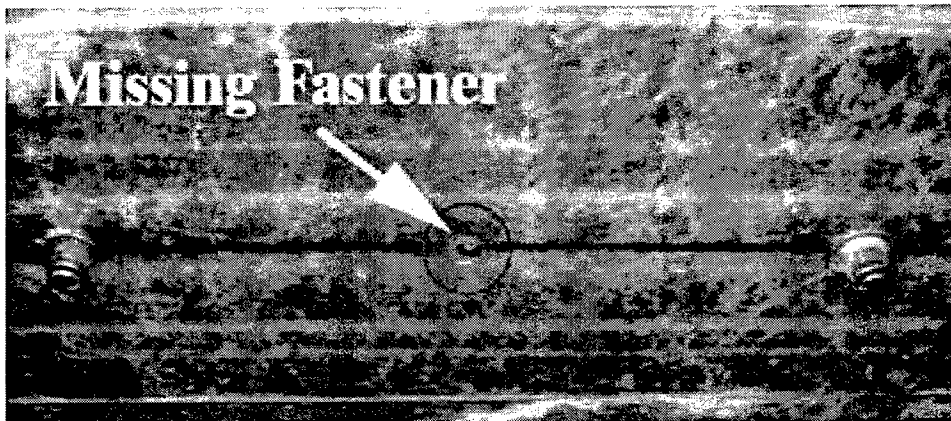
Missing fastener resulting from pocket of poor consolidation in the concrete
